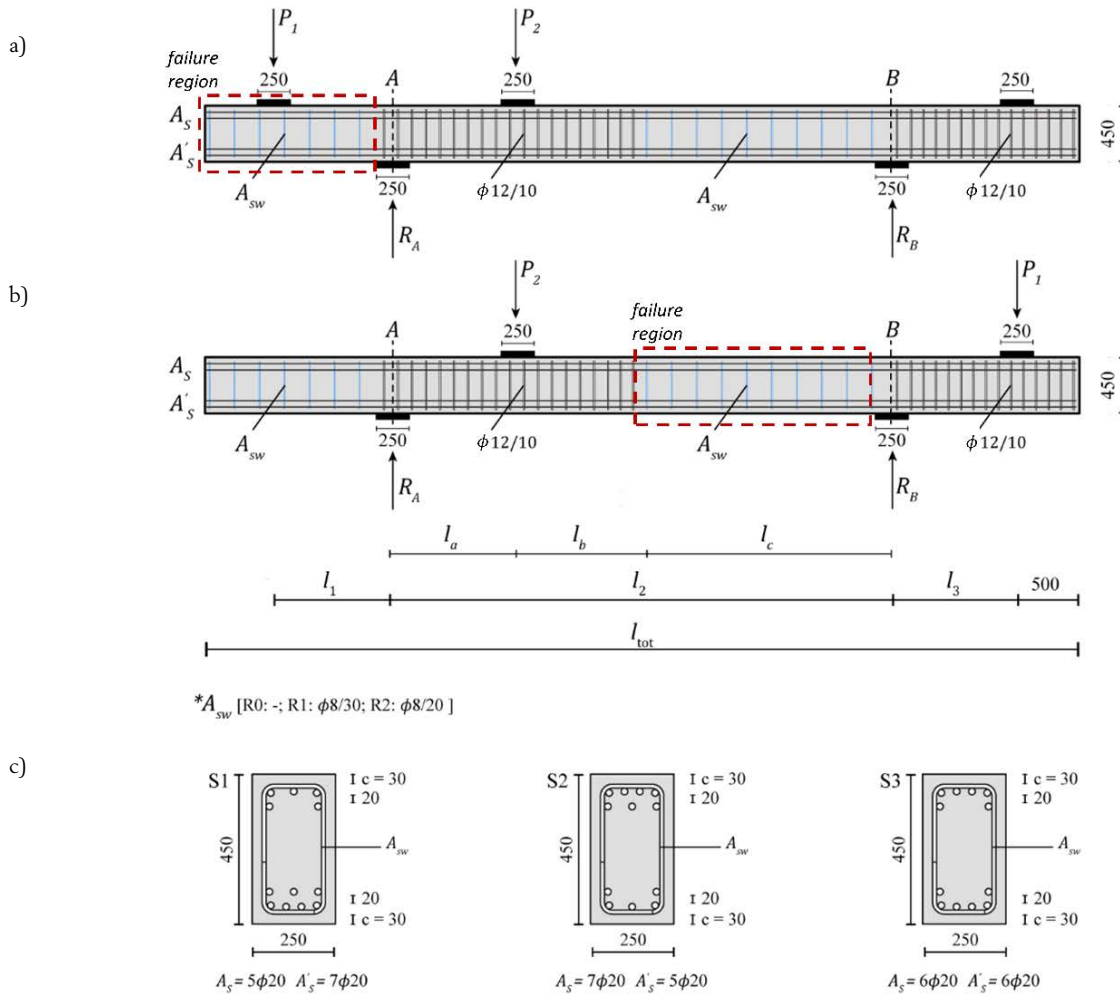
Reinforcement, geometry and load arrangement of the specimens in (a) cantilever test and (b) continuous beam test; (c) flexural reinforcement of section type S1 (specimens B1, B4, B7, B10 and B13), S2 (specimens B2, B5, B8, B11 and B14) and S3 (specimens B3, B6, B9, B12 and B15) (dimensions in mm).
